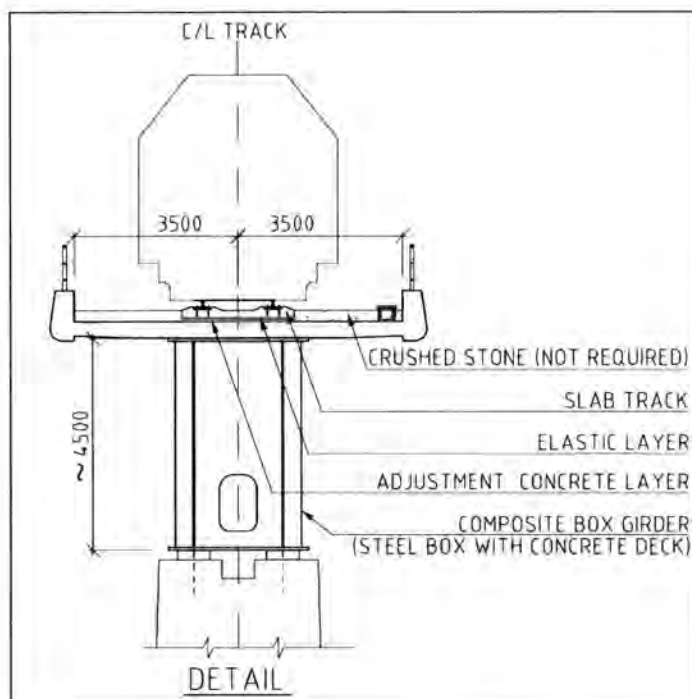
Bridge at Imsroa. Typical cross sections and details.
